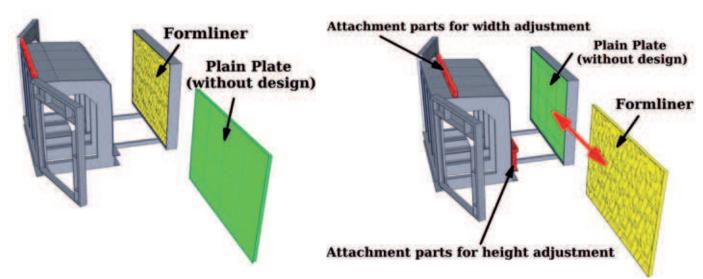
, Fig. 11: Mould for L-shaped retaining wall
